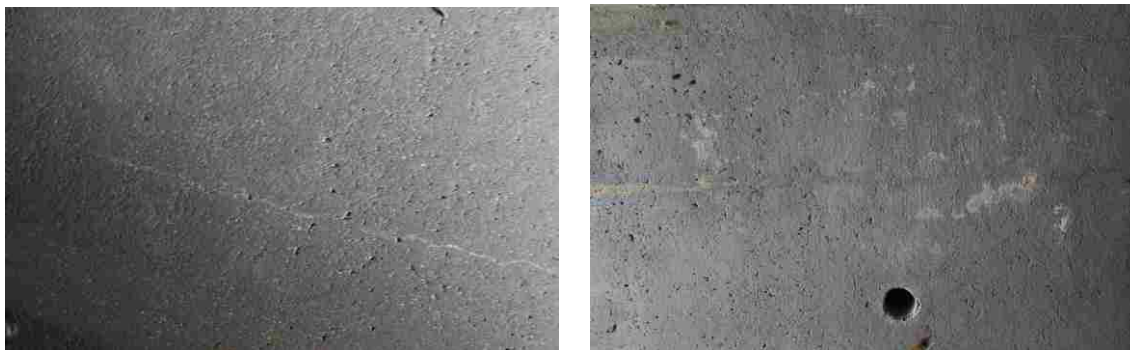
The cracks on the top (left) and bottom (right) of Box 12
